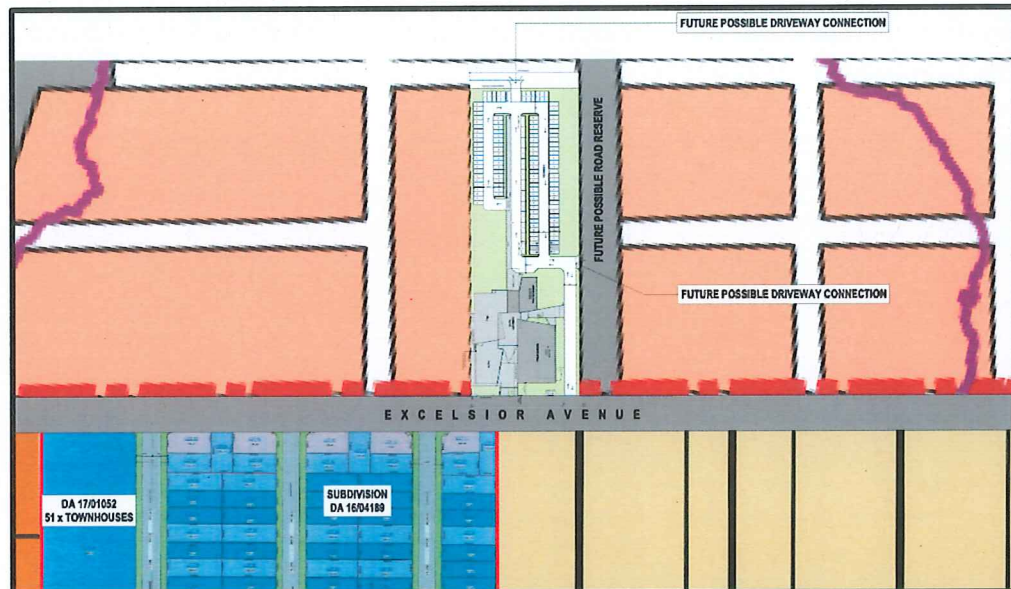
Overlay of the proposed development onto the draft Marsden Park North ILP and the adopted Marsden Park ILP (to the south of Excelsior Avenue). The future possible driveway connections to the site are also identified, pending the construction of the future road network. Source: Fulton Trotter Architects.
